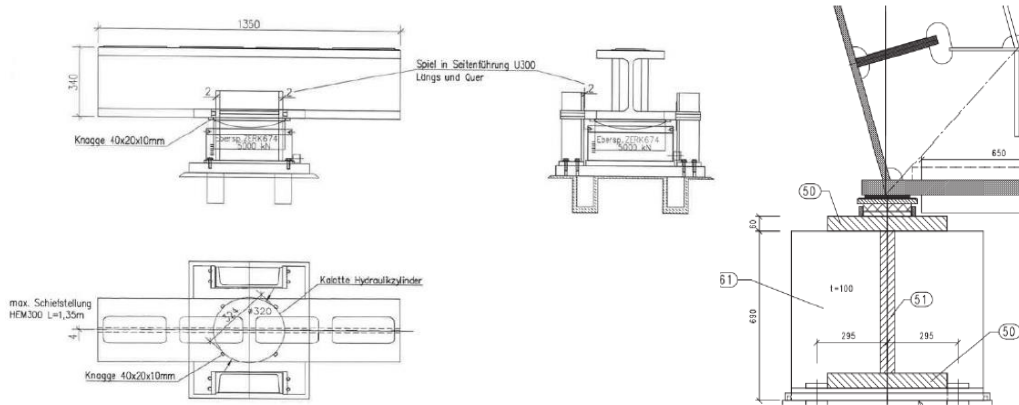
connection launching bearings – bearing, section – bearing. Principle of the hydraulic bearings of the company Max Bögl Stahl- und Anlagenbau GmbH & Co. KG [3]
